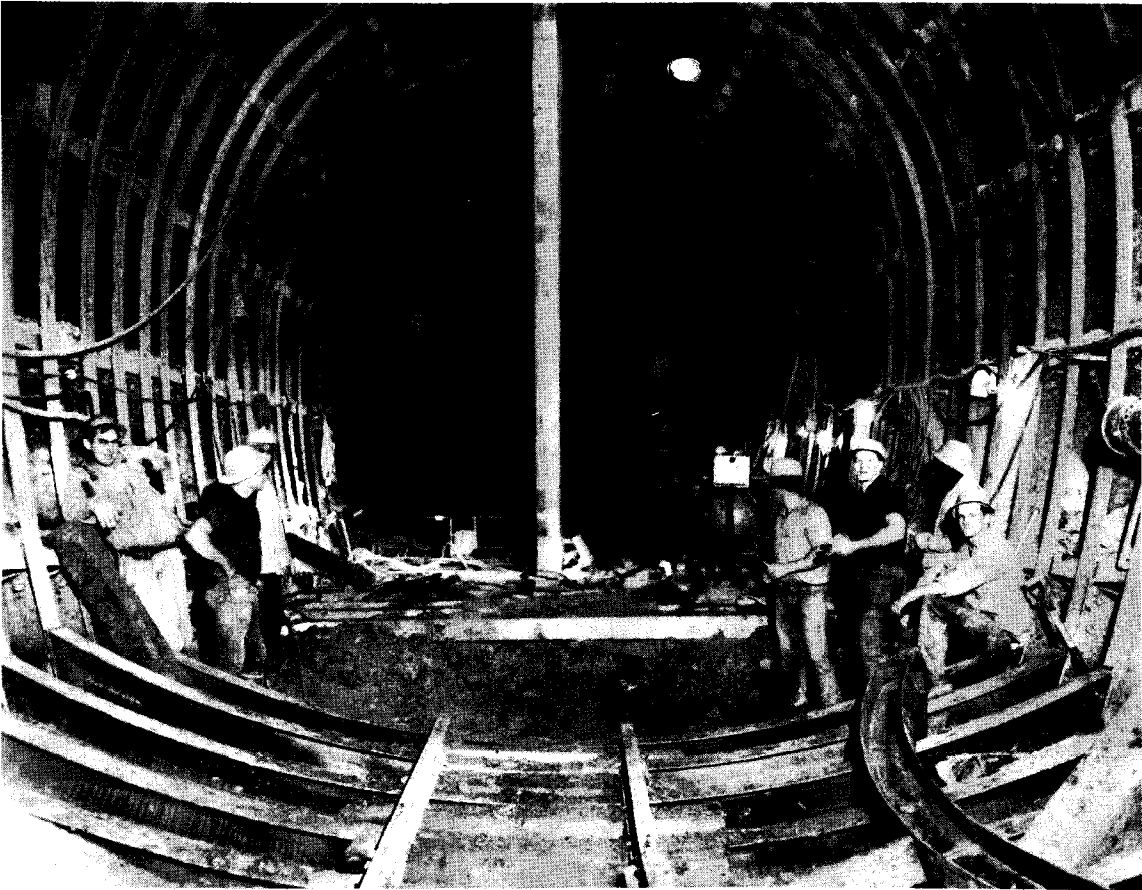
Excavation of C2 tunnel through Hayward Fault (photograph from BART files).
